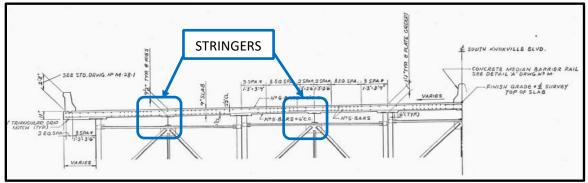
Steel Span & Stringer Cross Half-Section, Current Configuration
